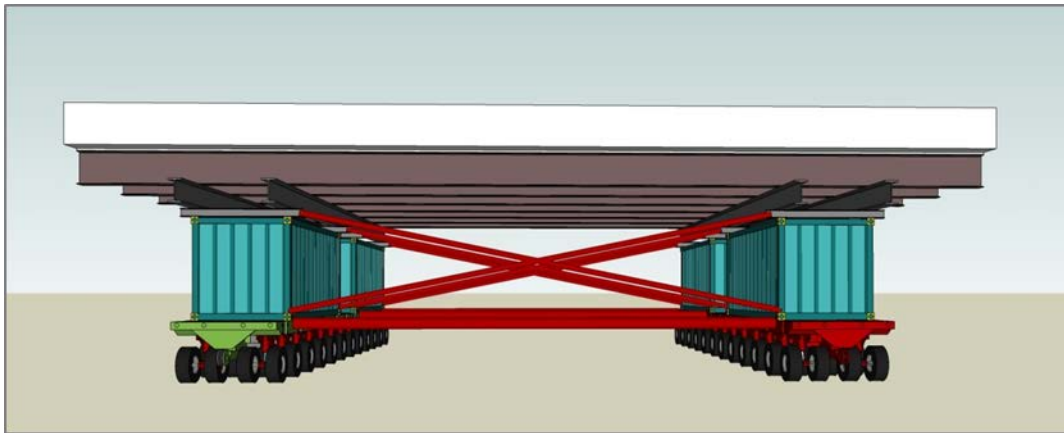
Schematic SPMT Bridge Move Configuration.
